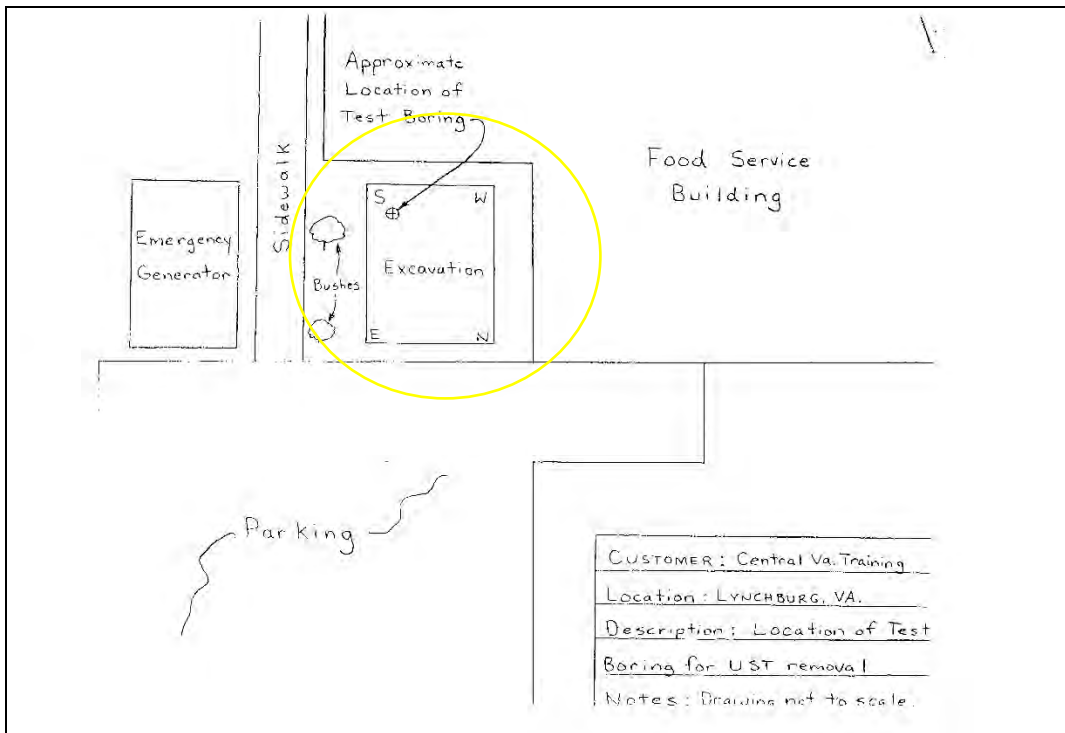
Portion of site map from Site Characterization Report illustrating location of samples and soil excavation boundary for PC 1992-1677 at Building 65
